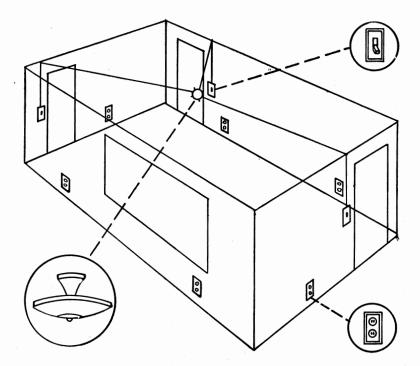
Perspective view of living room showing convenient arrangement of switches and convenience outlets.
